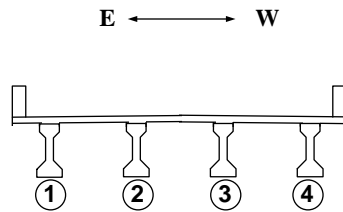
Transverse cross section of bridge at Jarrell and IH-35
